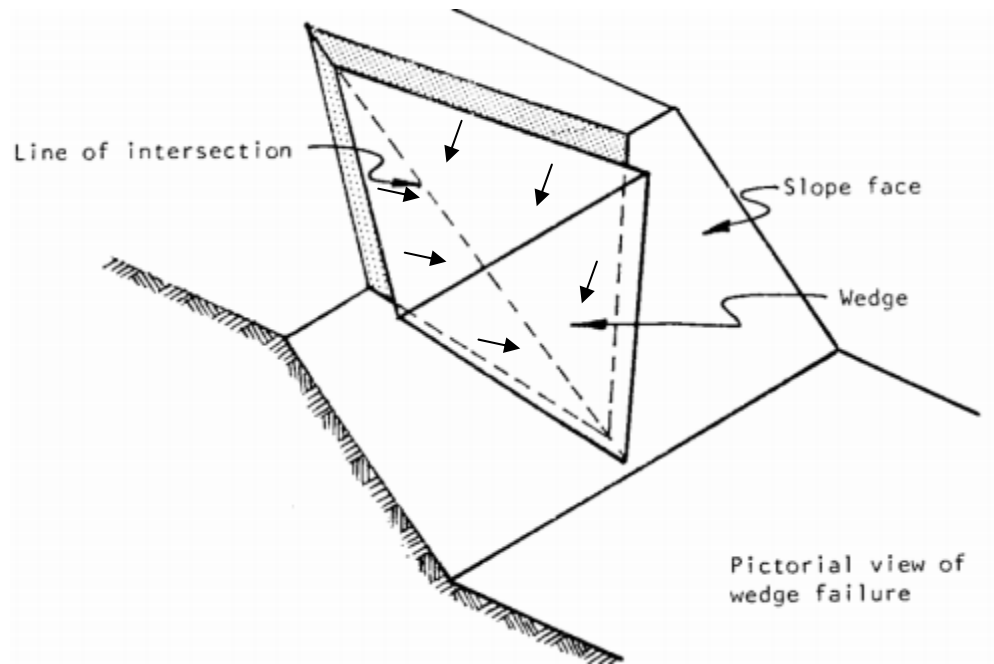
Schematic of two intersecting joints causing wedge failure.
